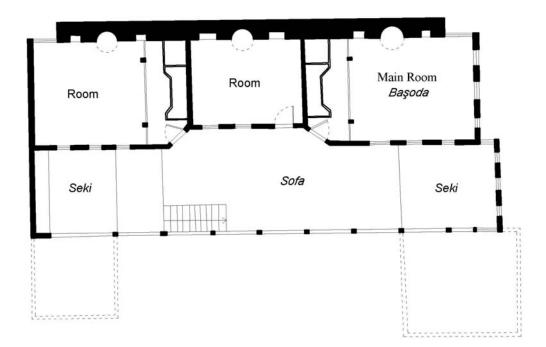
The top floor plan of Beyler House in Kula, Manisa.
